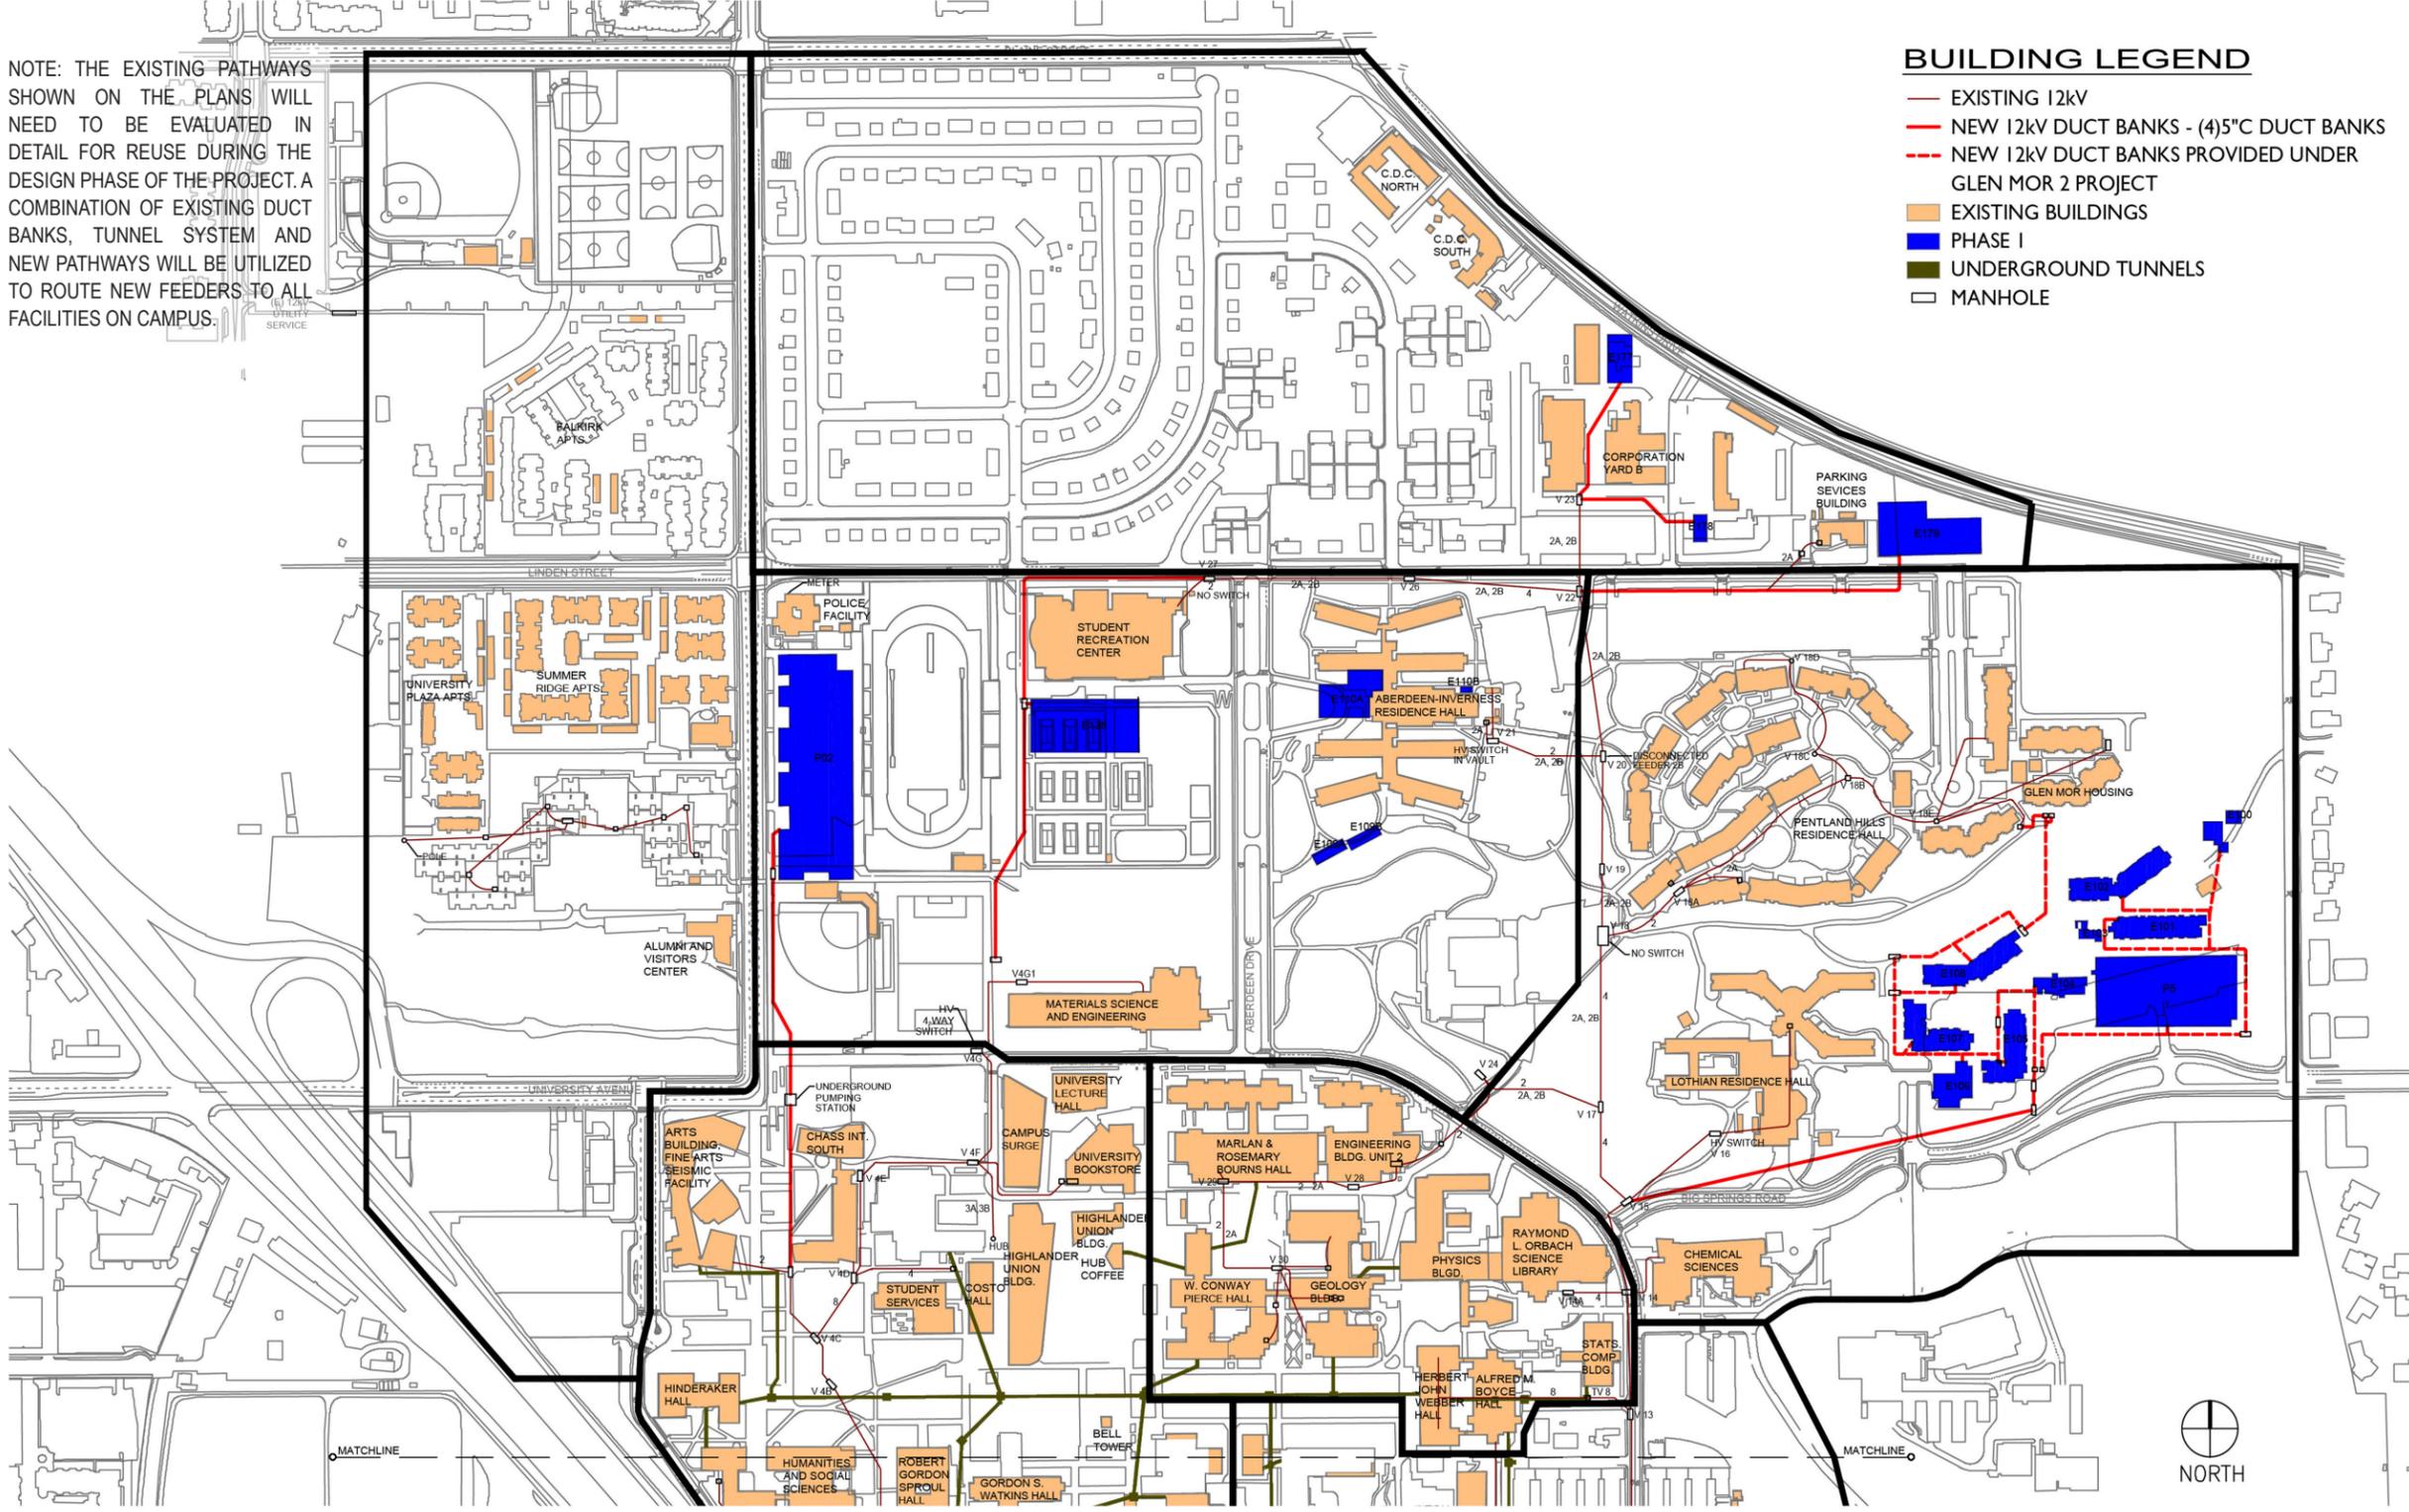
Phase 1 Buildings Electrical Site Plan–North
